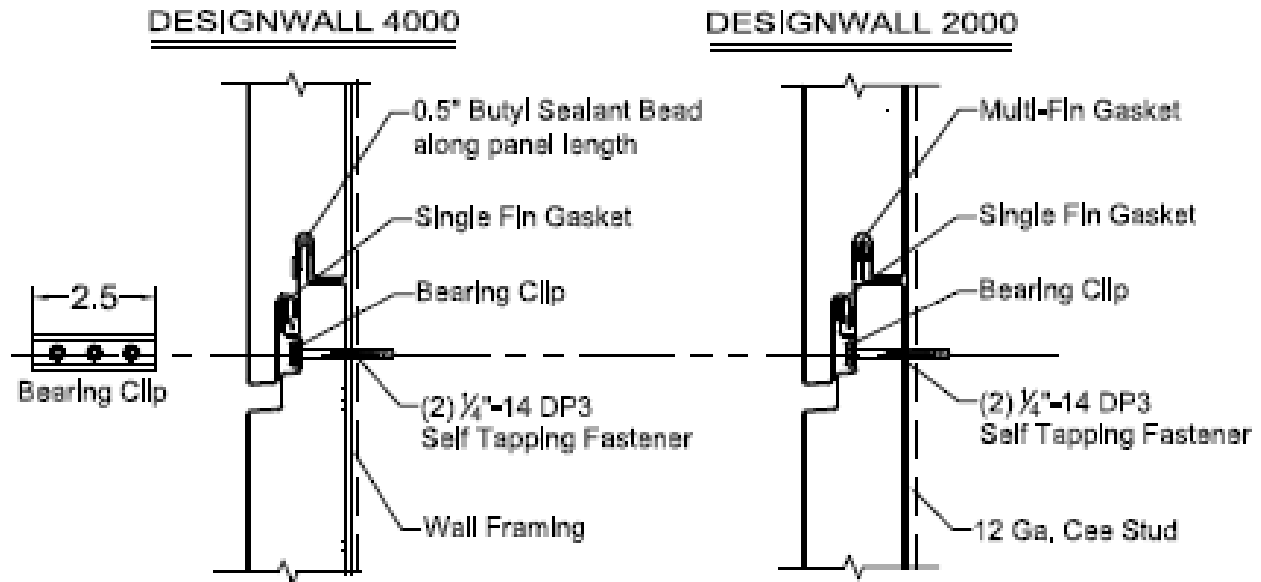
Designwall 2000 and Designwall 4000 Installation Details for the Dual Tongue and Groove Joint
